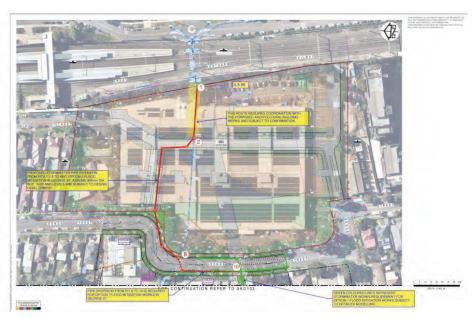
Proposed Stormwater Diversion Works & Flood Mitigation works
